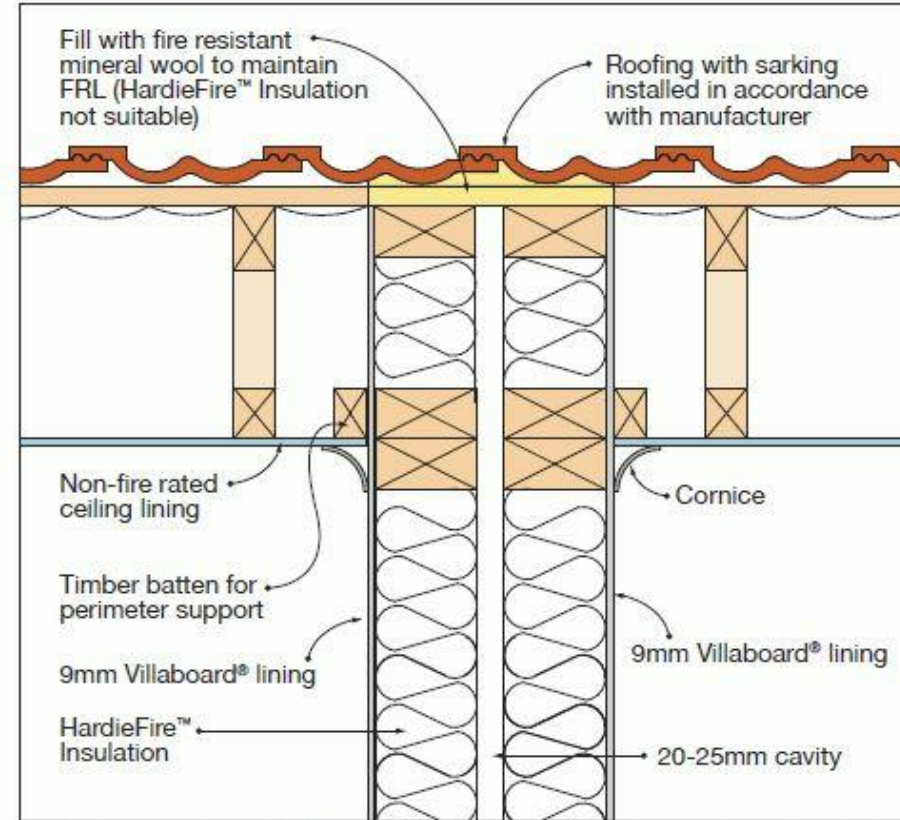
HARDIESMART™ INTERTENCY WALL SYSTEM WITH PARALLEL ROOF TRUSSES
